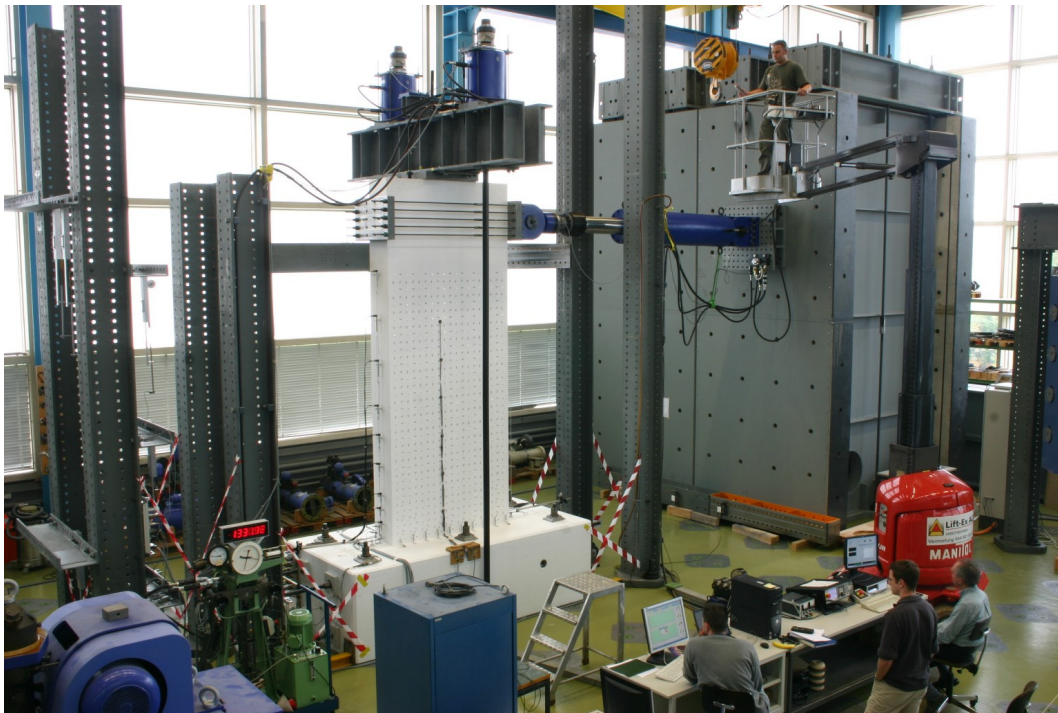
Setup for quasi-static cyclic tests on wall-type bridge piers at ETH Zürich
